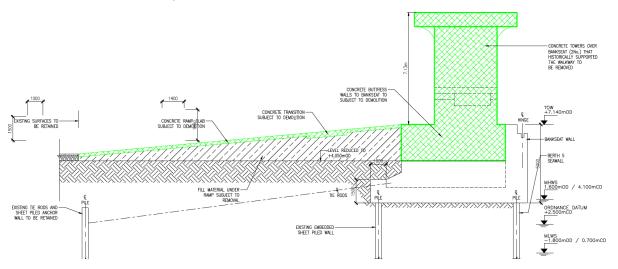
Cross section through Ramp & Bankseat extracted from drawing DUN-WMC-ZZ-XX-DR-S-P7000
